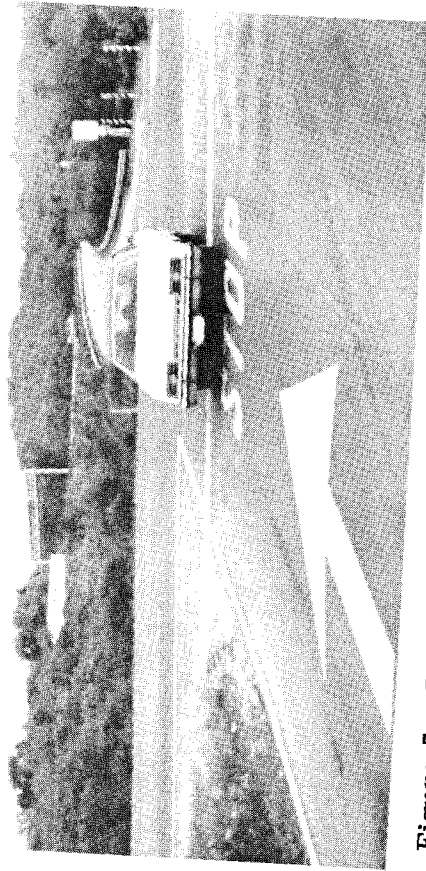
Junction of I-95 South exit ramp and Route 1 after marking of the left flare. Note that the driver ignores the stop line to get a better view of the crossroad.
